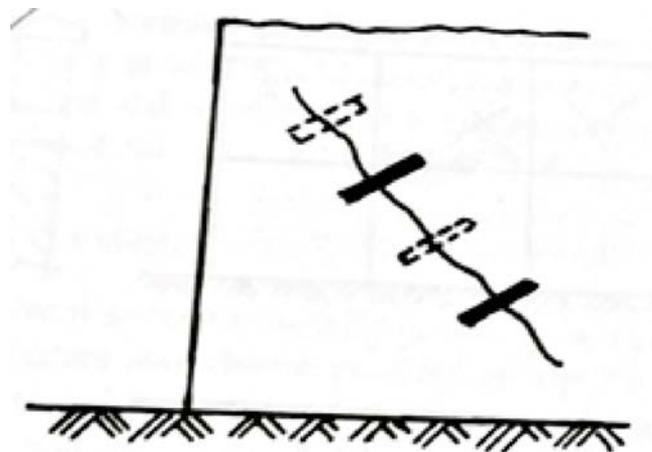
Repair of cracks in masonry by stitching with steel rods.
